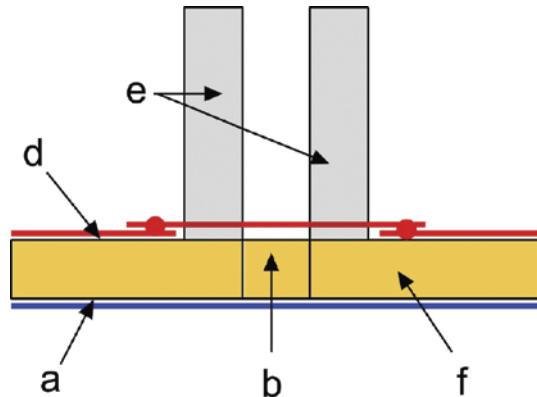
a) weather barrier, b) site insulation, c) insulated roof cassette, d) air barrier, e) party wall, f) external wall cassette.
